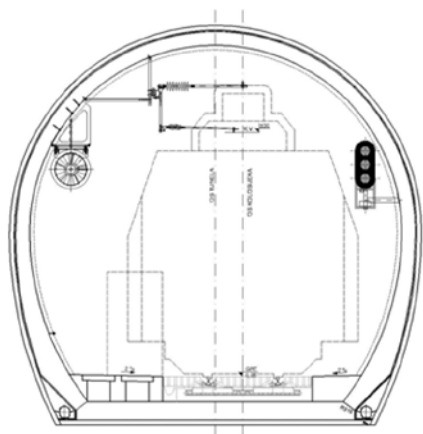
Cross section of a single tube tunnel with necessary equipment, [4]
